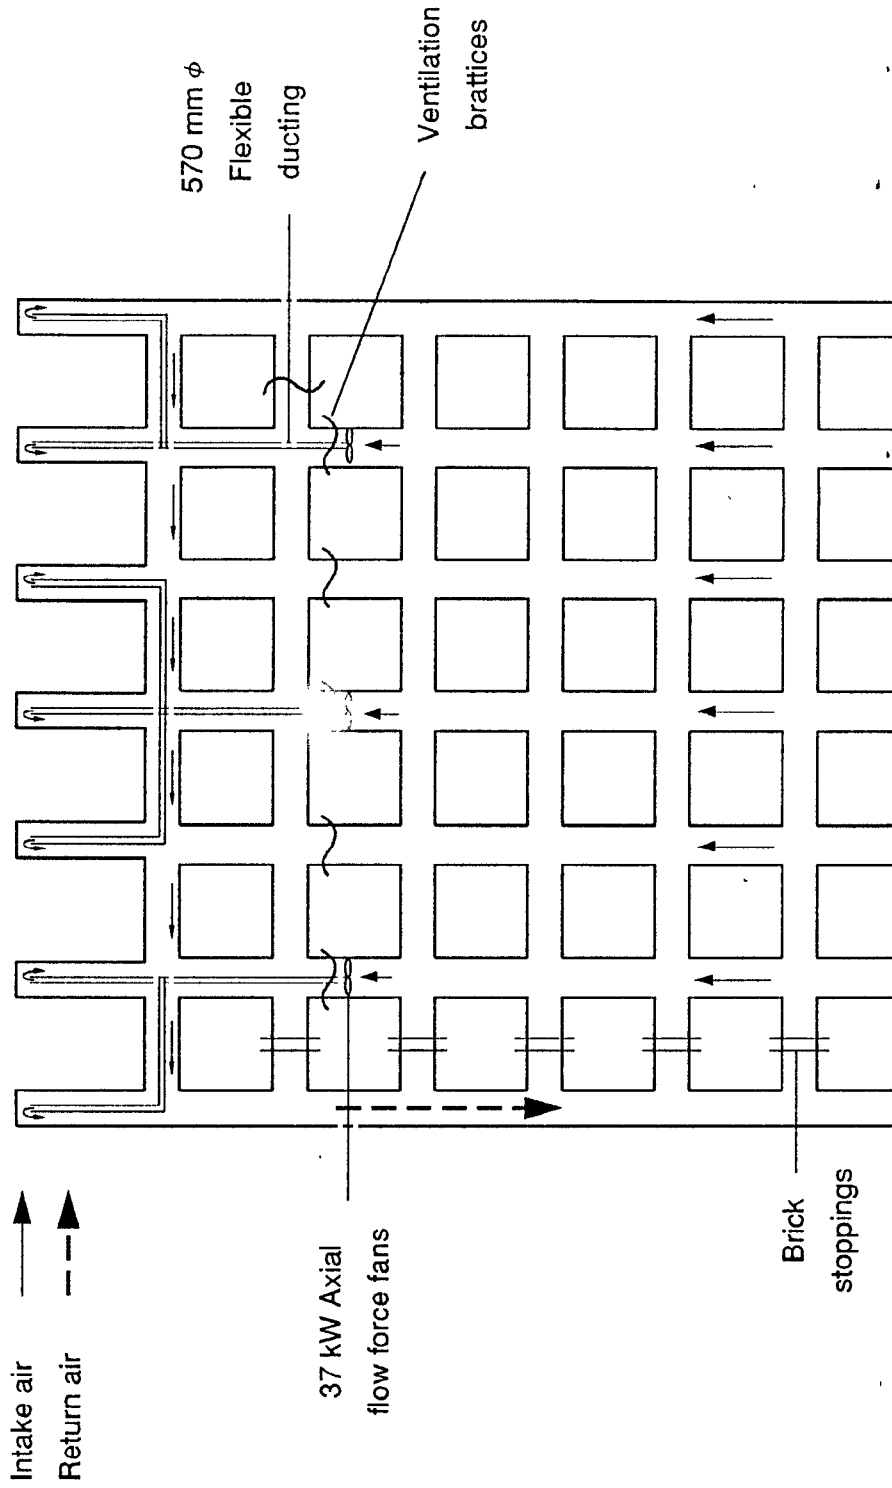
Ventilation layout for bord and pillar development using coursing ventilation.
